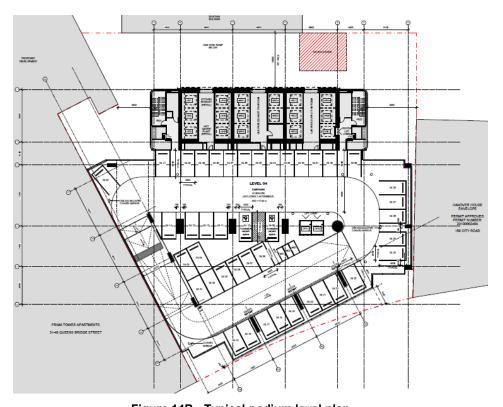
B - Typical podium level plan (source: application plans prepared by Grimshaw Architects)
